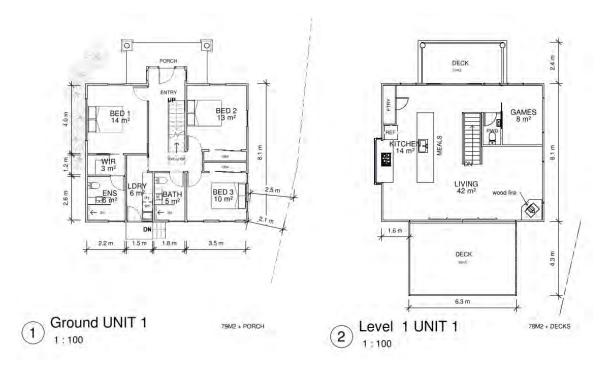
Shows the dwelling 1 (unit 1) floor plans.
